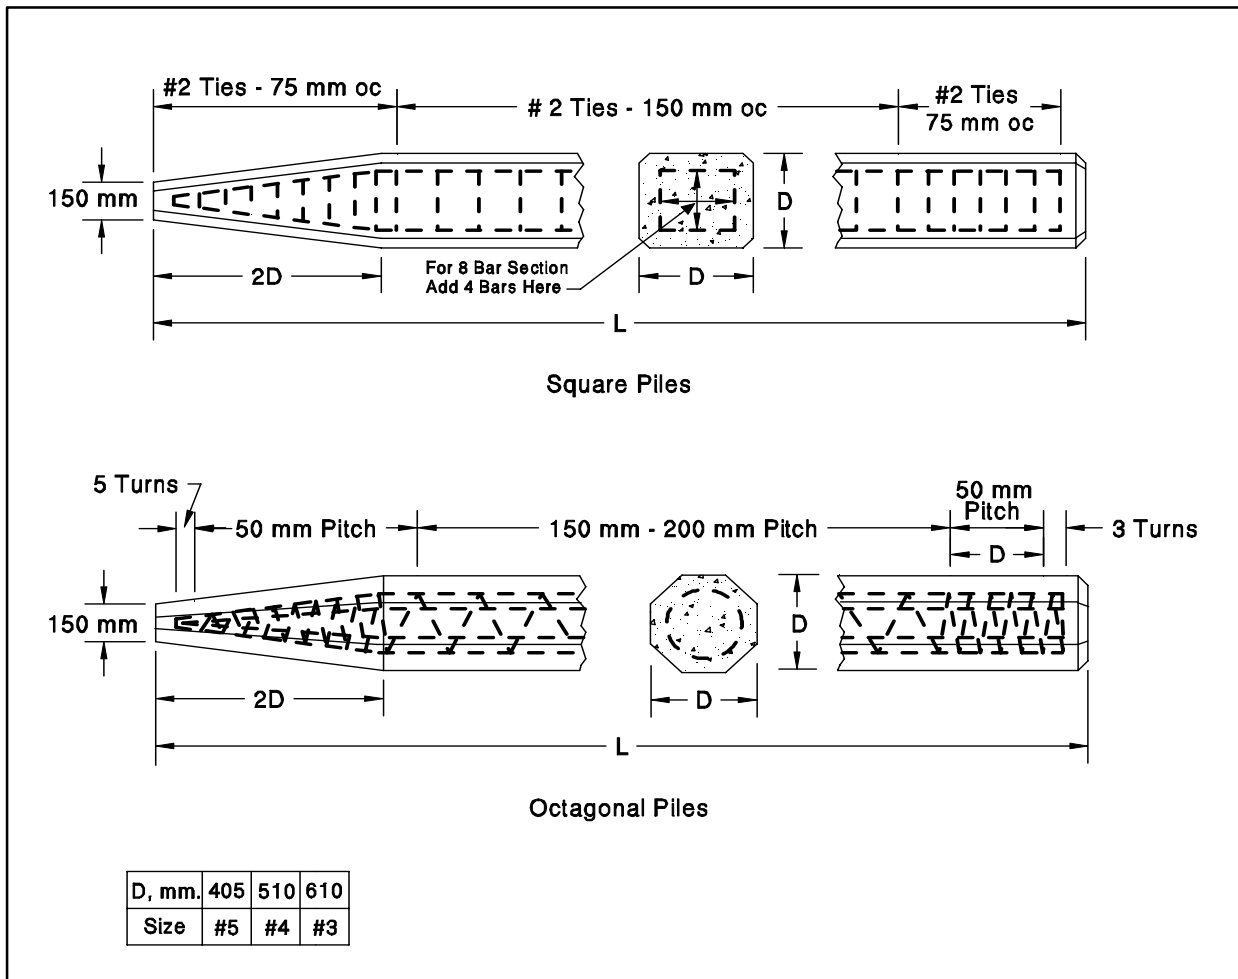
Typical Conventionally Reinforced Concrete Pile Details (after PCA, 1951)
